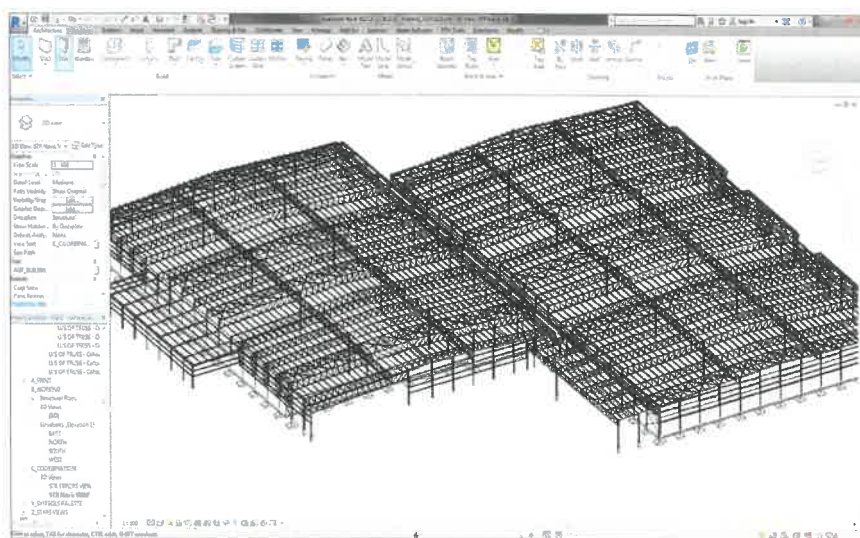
3D BIM Image of the Manufacturing Building (Structural Steel Model)
